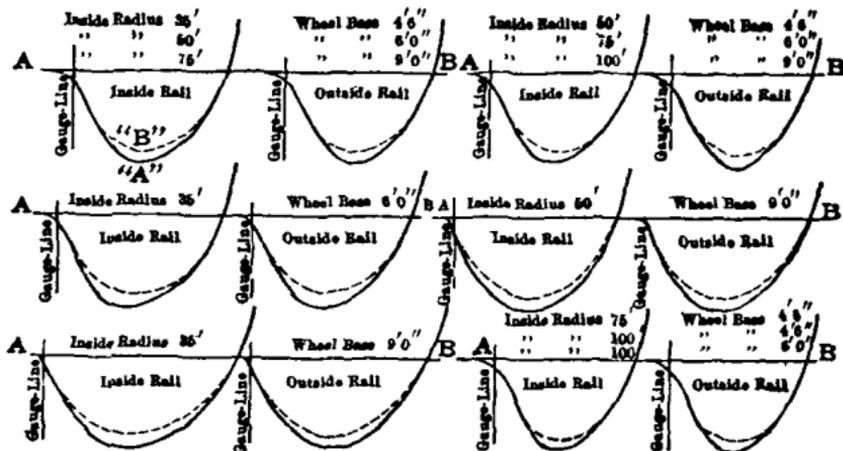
Minimum grooves for Am. El. Ry. Eng. Assn. flanges A and B
